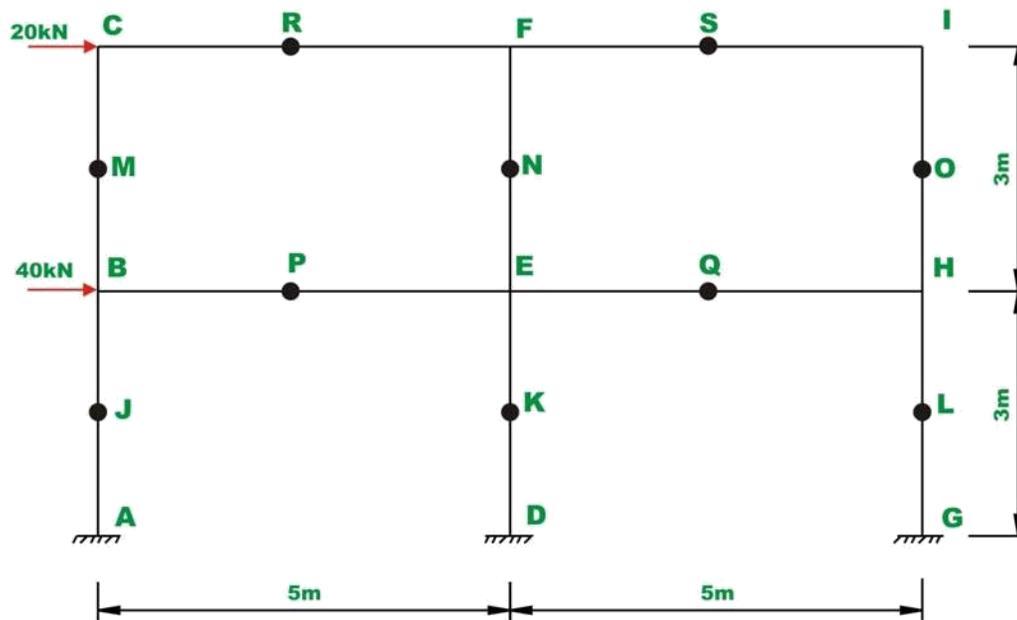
Two storey building frame subjected to lateral load of Example 36.2
